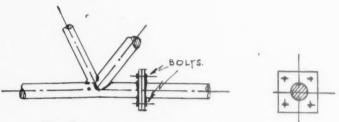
DETAIL. JOINT FOR SMALL SPANS.
